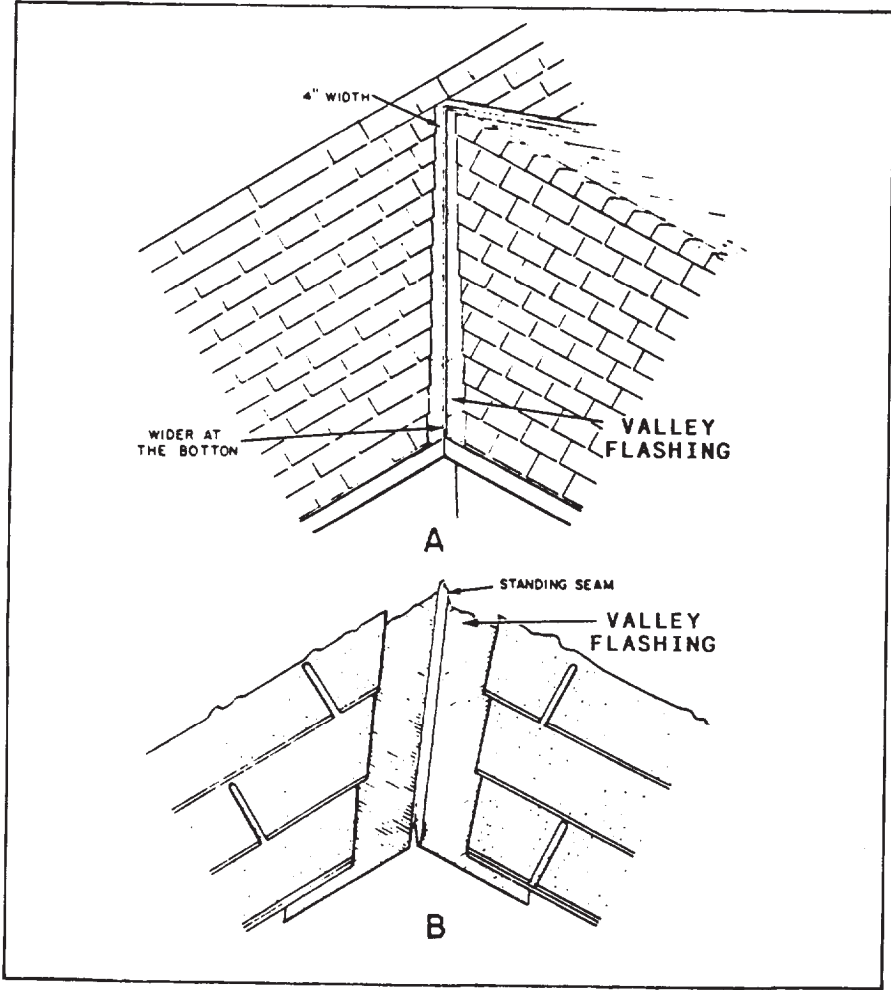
Valley flashing: A. Valley; B. Standing seam.
